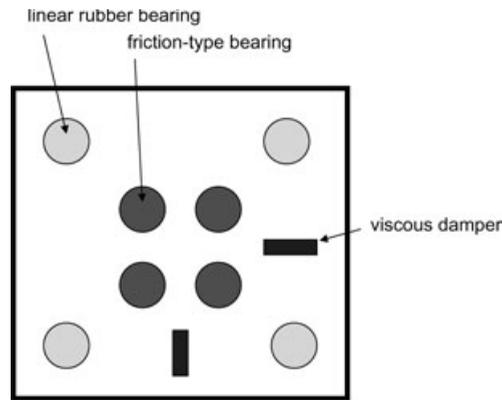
BI system consisting of linear rubber bearings, friction-type bearings and additional viscous dampers
